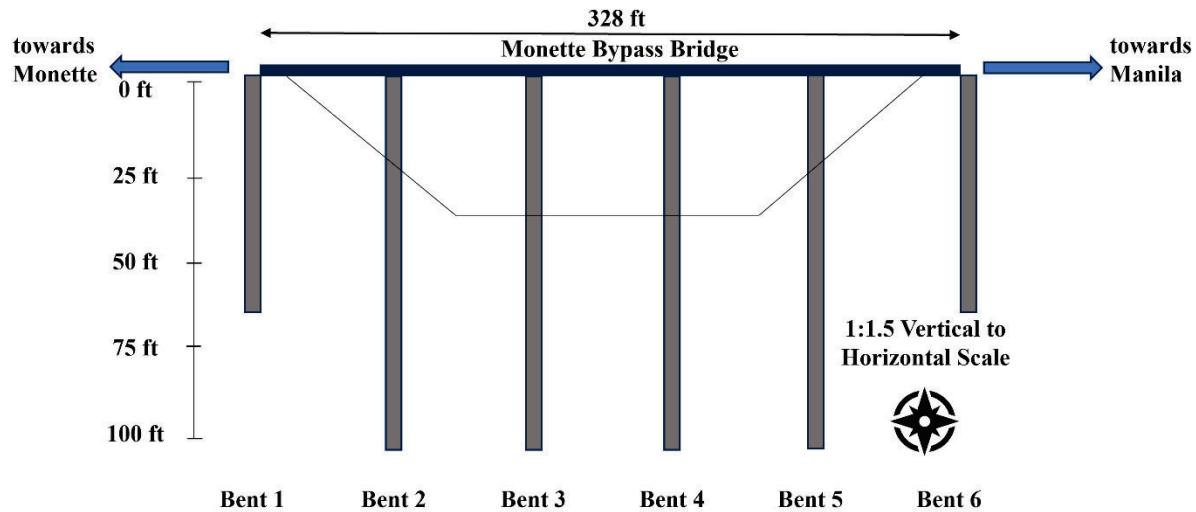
Elevation View of the Monette Bypass Bridge with Pile Bent Numbering
